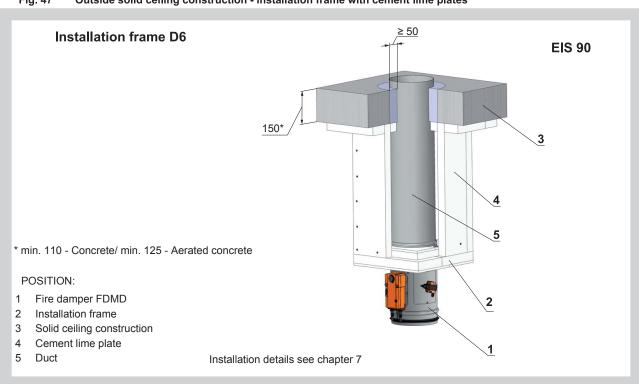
Outside solid ceiling construction - installation frame with cement lime plates
